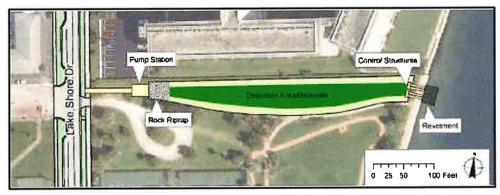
Pump Station for Lake Shore Drive Drainage Improvement Project
